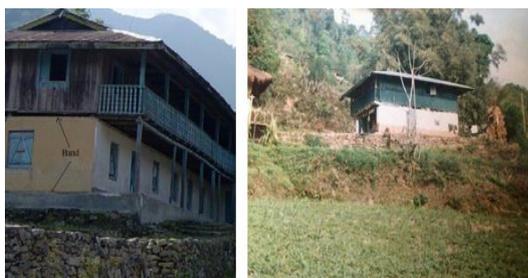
Composite timber first floor supported by brick masonry(left) and rammed earth (right) in ground floor
